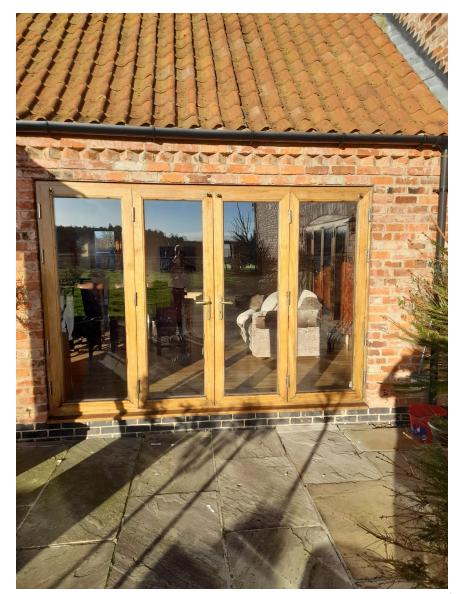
image showing materials, recycled brick, pantiles, limestone paving, window/door profile and colour of staining to wooden doors and windows
